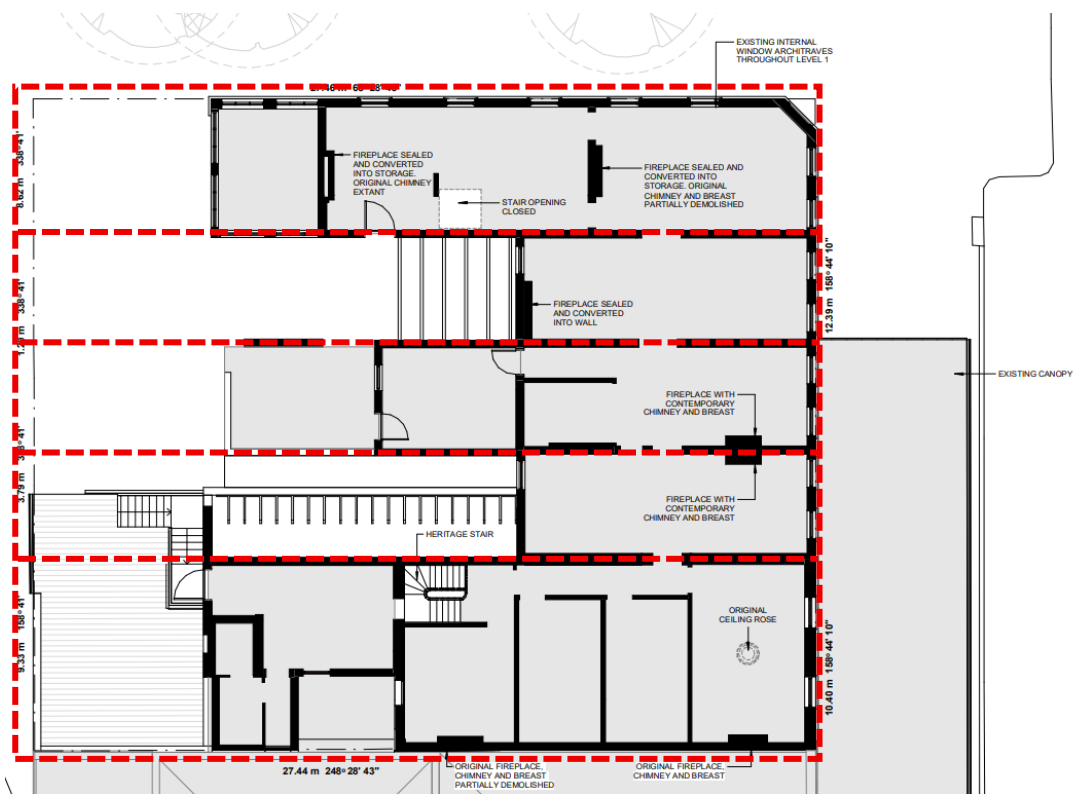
Existing first floor plan showing the site being read as five premises, from north to south. Source: Embrace Architects, 2026.
